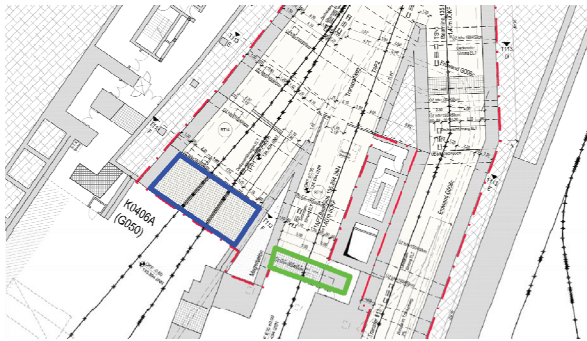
Architect plan of tunnel T113. Blue line – planned shielding wall for G050, green line – for G006c.
